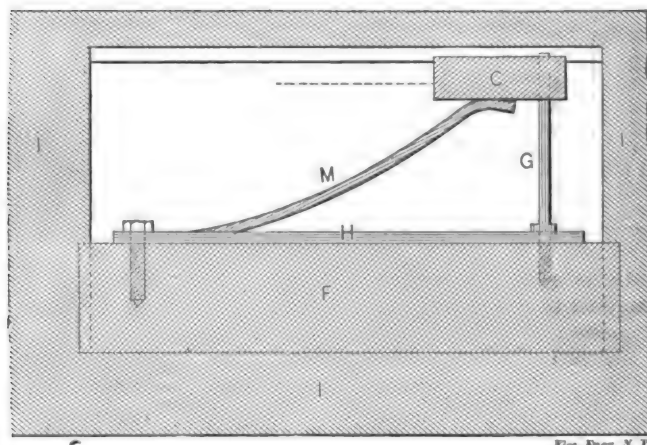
CURTIS' ELECTRIC RAILWAY CONDUIT.
